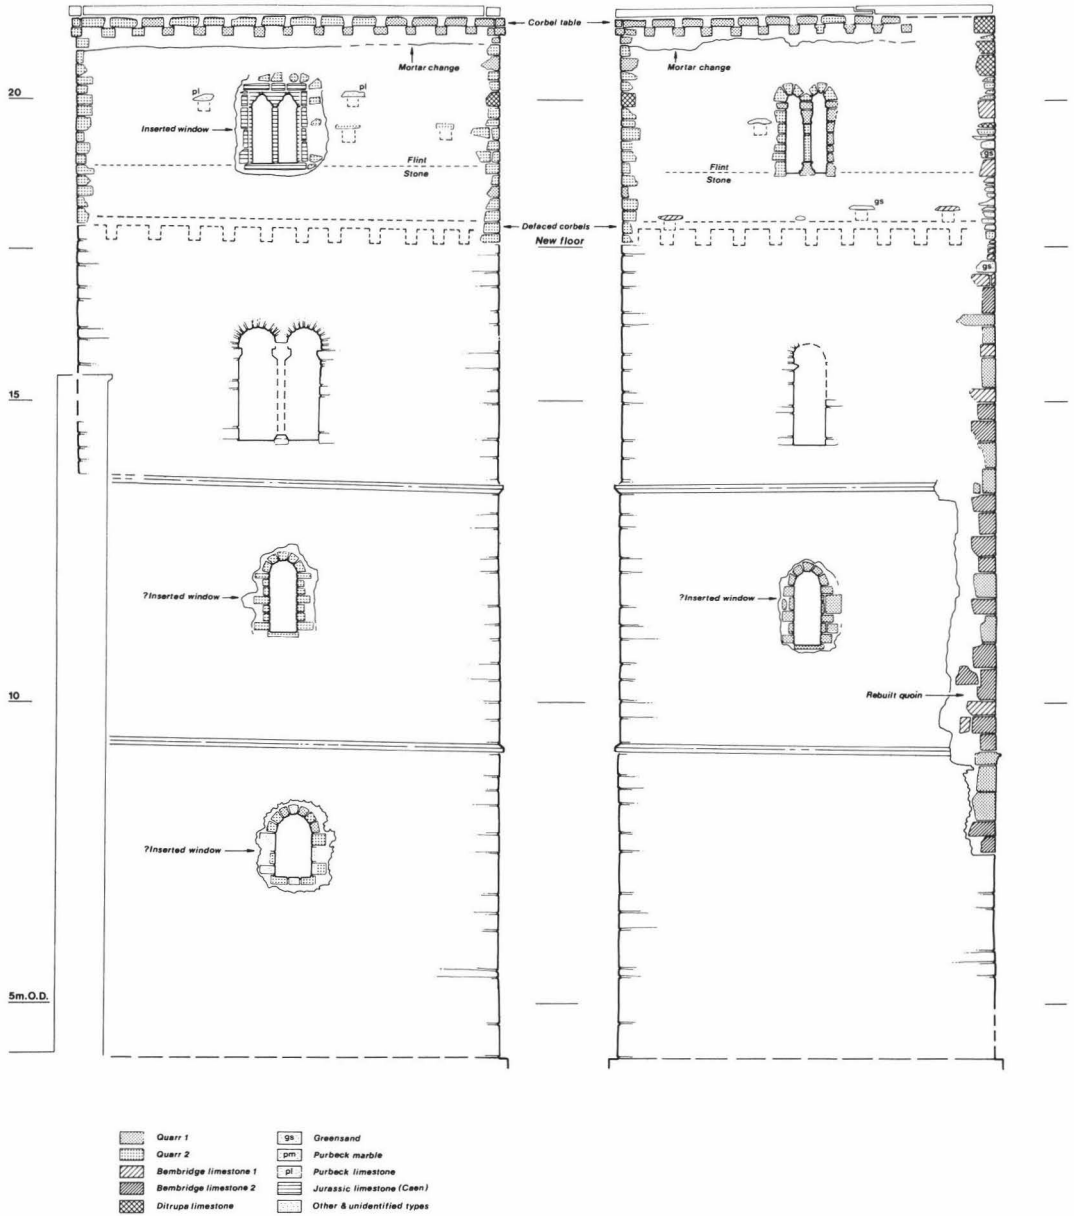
The north and west elevations of the tower showing in detail the post-Conquest (Period 2) and later features.
